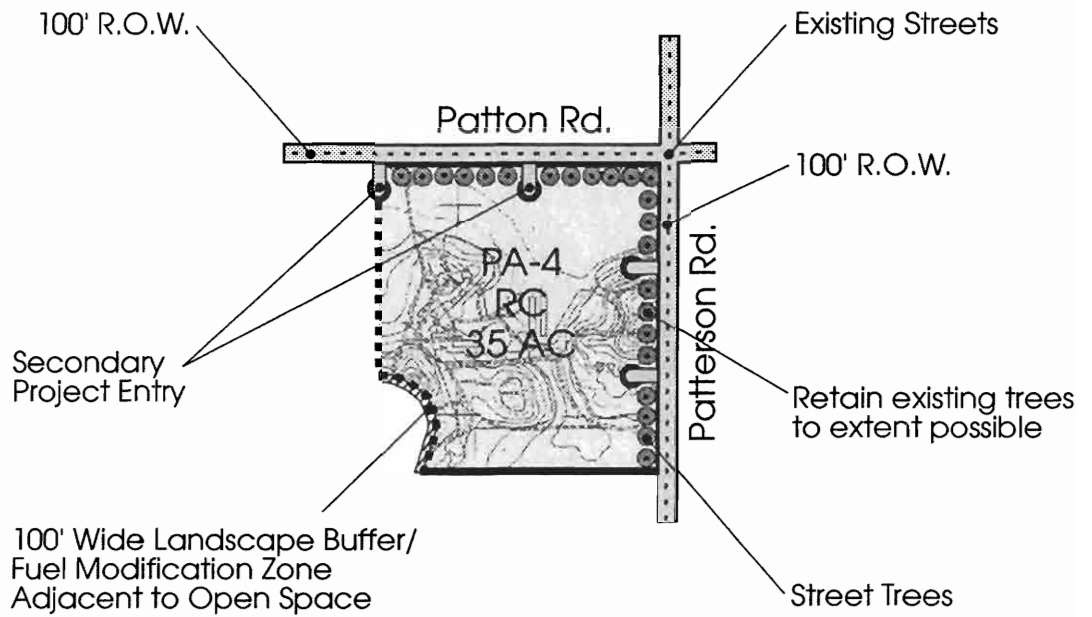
shows Planning Area 4 and its relationship to roads and adjacent planning areas. As shown, access to the planning area will be taken from Patton and Patterson Roads. Cross-access between Planning Area 4 and Planning Area 3 shall be allowed if individual project designs warrant.
